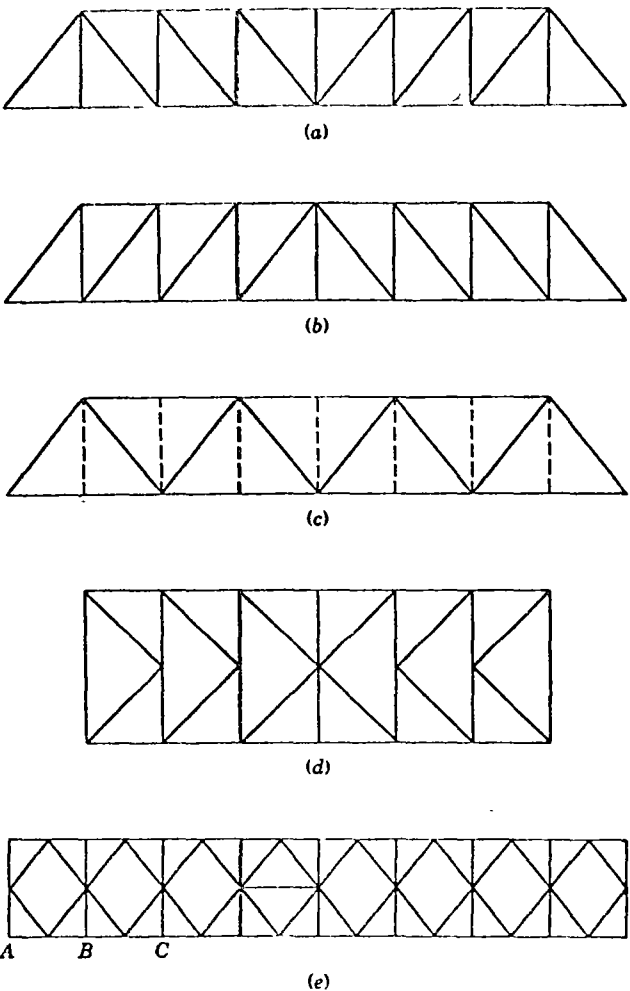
Truss types: (a) Pratt truss, (b) Howe truss, (c) Warren truss, (d) K-bracing system; (e) Diamond bracing system.
